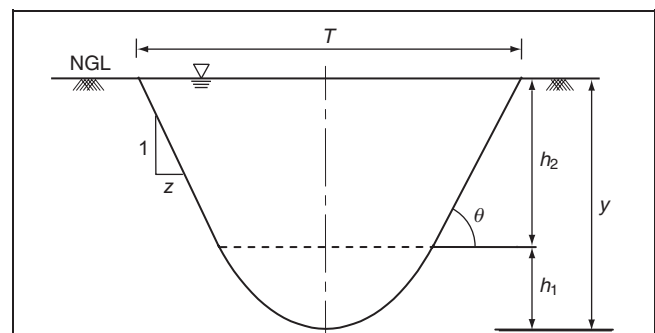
Cross-section of a parabolic bed trapezoid canal section
